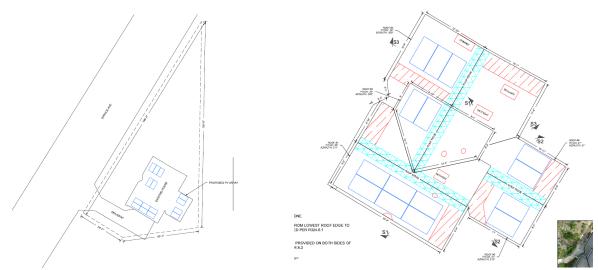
The site plan (left) shows the proposed solar panel locations and the building's relationship to the public right-of-way along Spruce Avenue. The roof plan (right) shows the proposed location of the solar panels and the equipment location.
